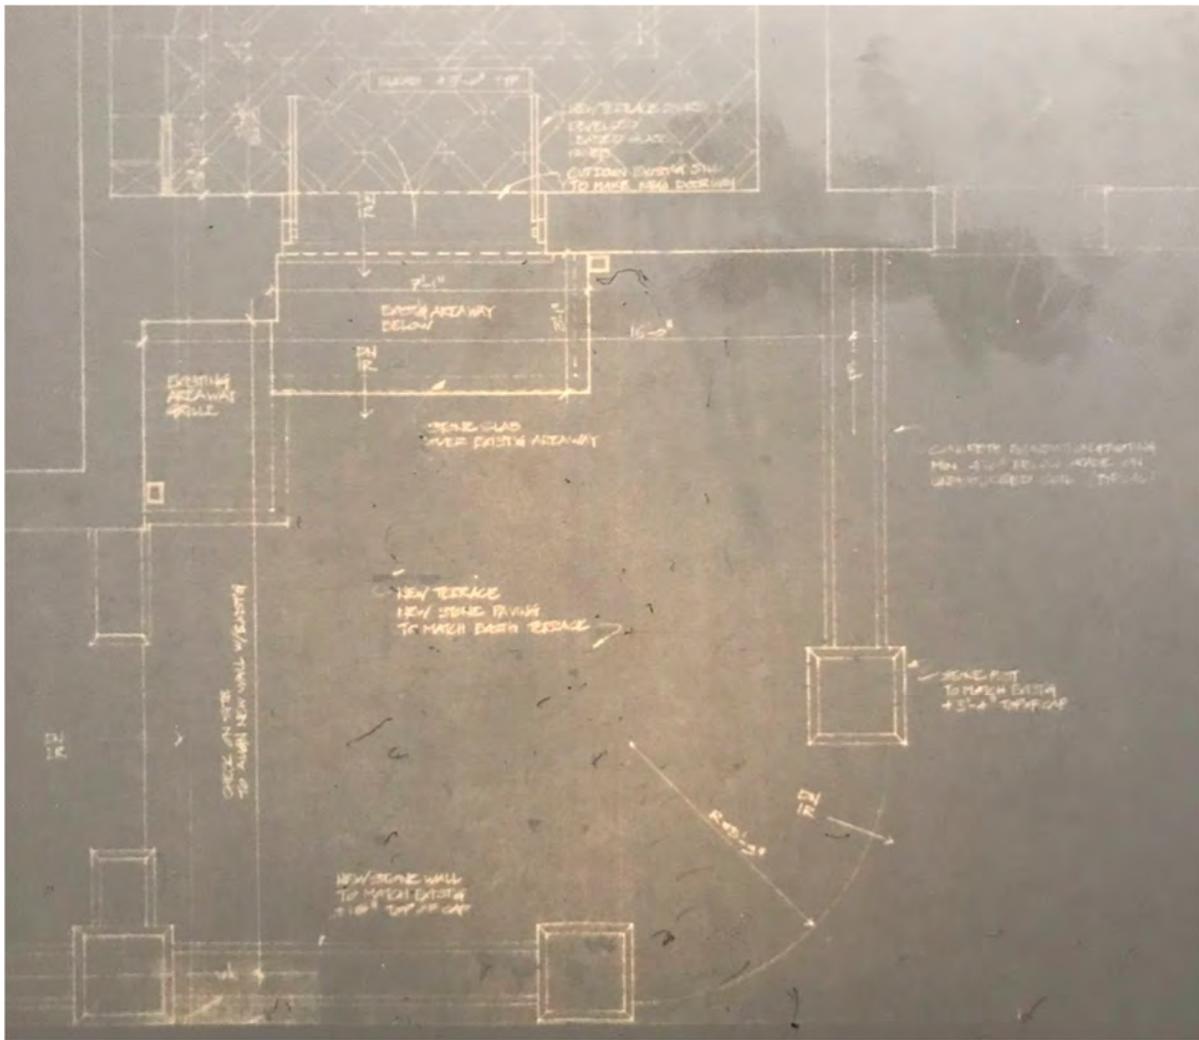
1991 architectural plan for an east addition to the original flagstone terrace, extension of the low stone walls with matching stone coping and new door opening on the south elevation. (Building Records)
